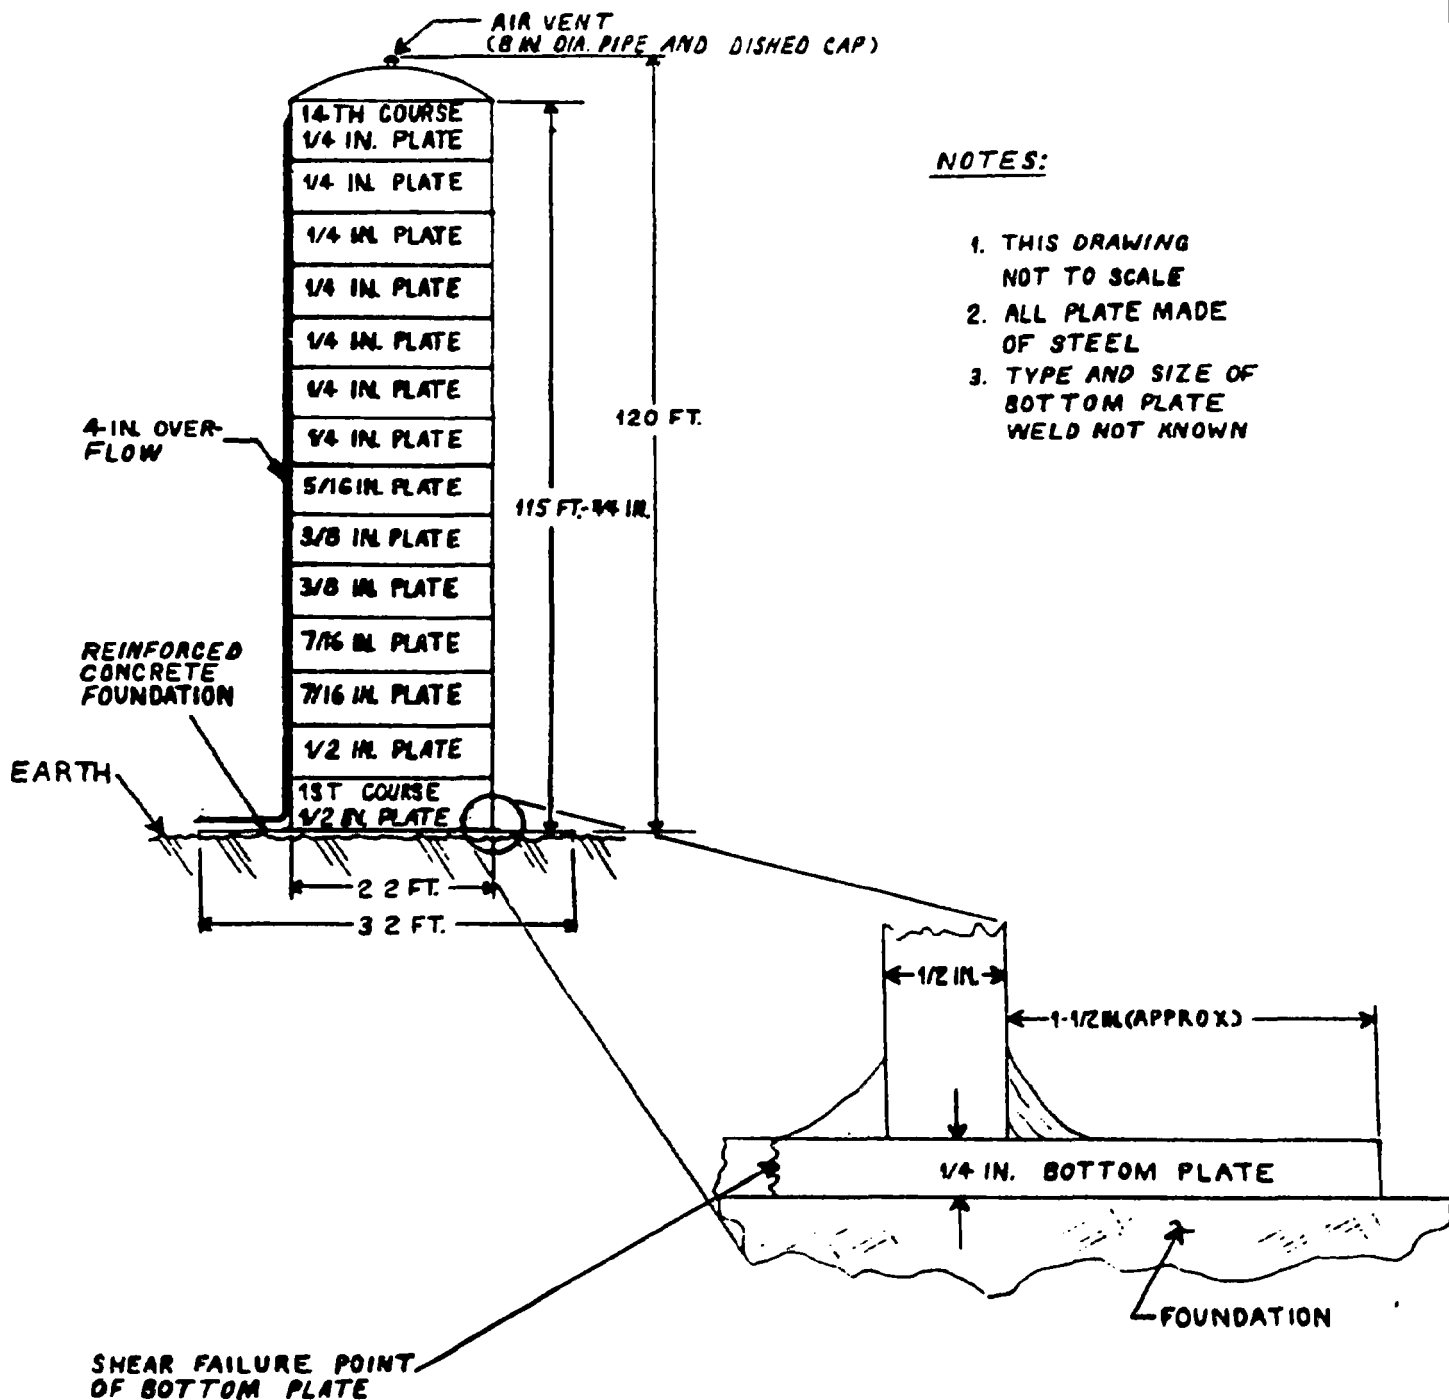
STANDPIPE CONSTRUCTION DETAILS
